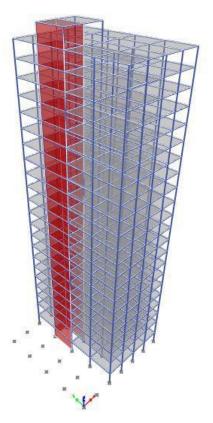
3D Sectional View of Structure with Shear Wall at Core
